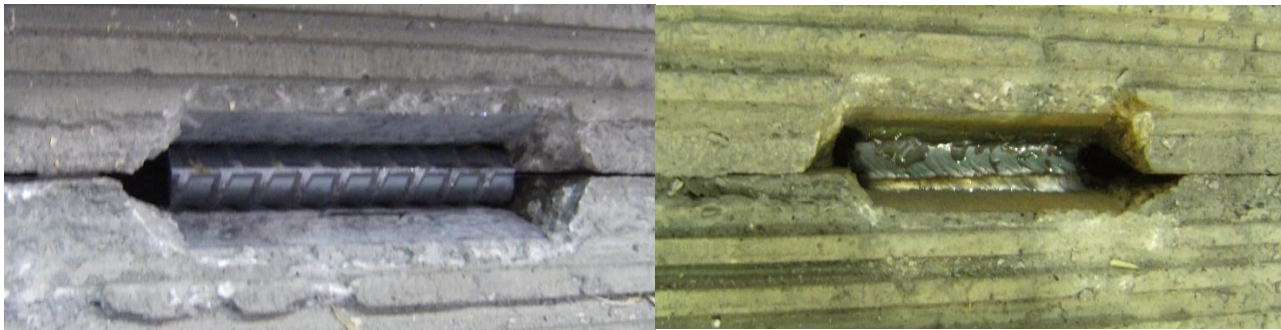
Embedded Plate Connection before (left) and after (right) Weld
